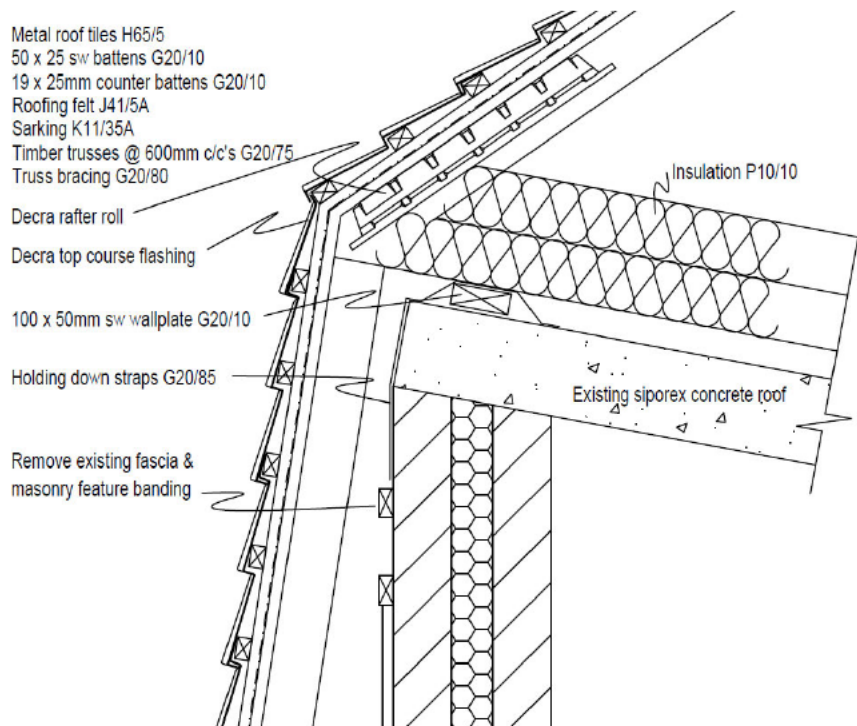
Section detail through eaves of refurbished mansard roof system (upper)
